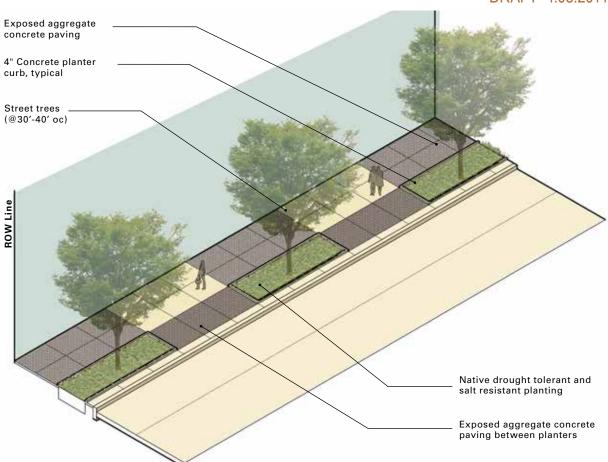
Axonometric drawing showing street paving configurations. Exposed aggregate paving aligns with the tree planters and extends to the ROW line, alternating with broom finish concrete between planters along the public sidewalk. Exposed aggregate paving is used in the band between planters, and a broom finish concrete accent strip is adjacent to the street curb.
